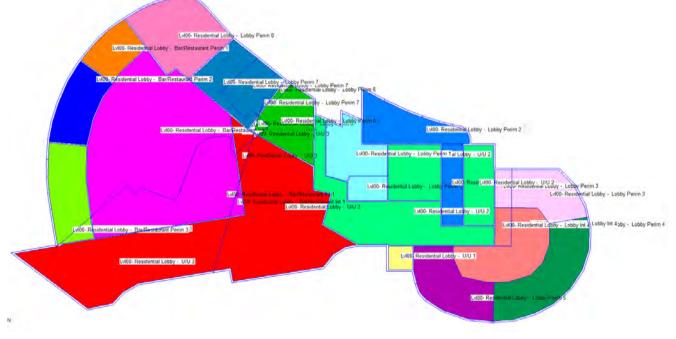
Ground Floor Residential Lobby HVAC Zoning
